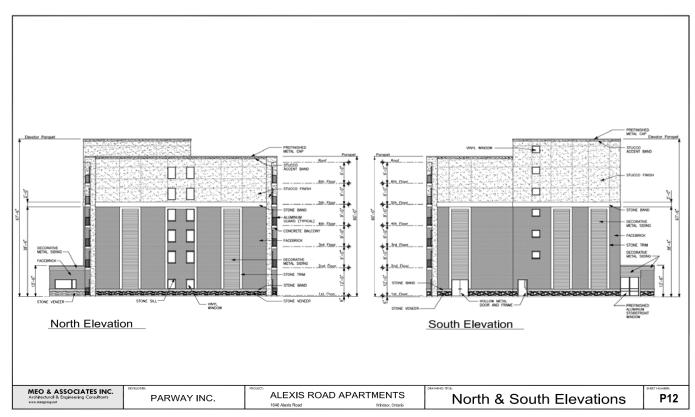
ELEVATIONS NORTH AND SOUTH
